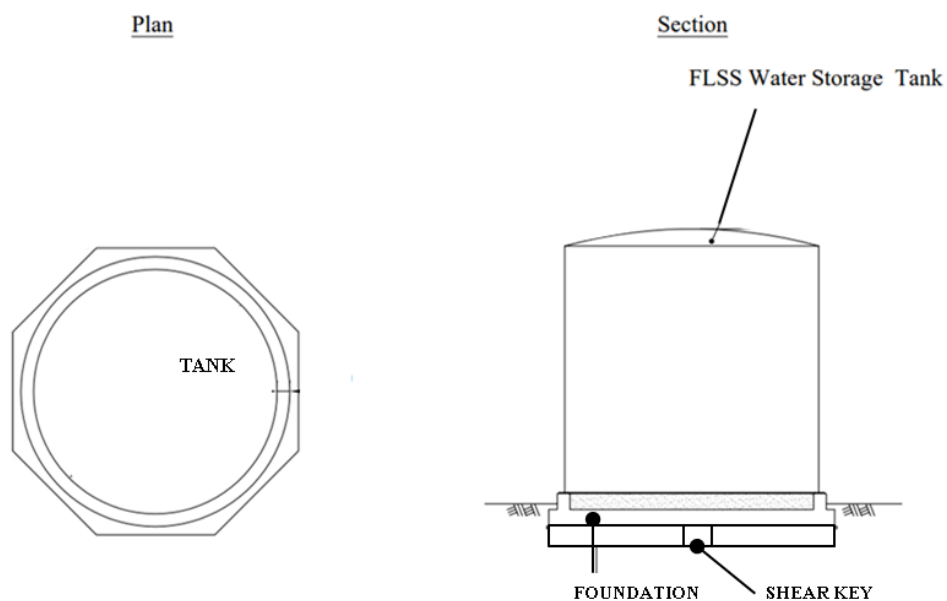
Plan and Section, FLSS WST Foundation
